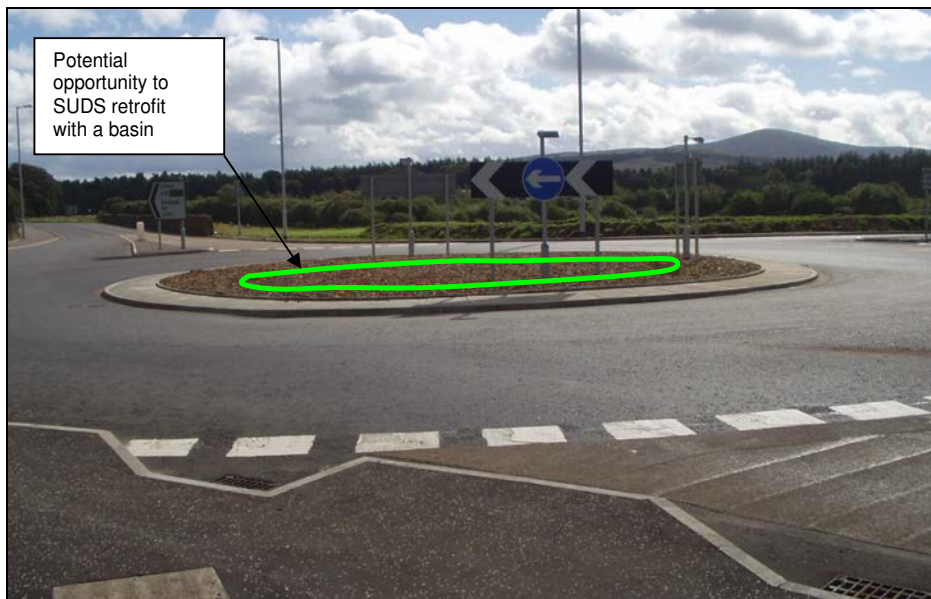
SUDS Retrofit in Roundabout Island, Lanark
